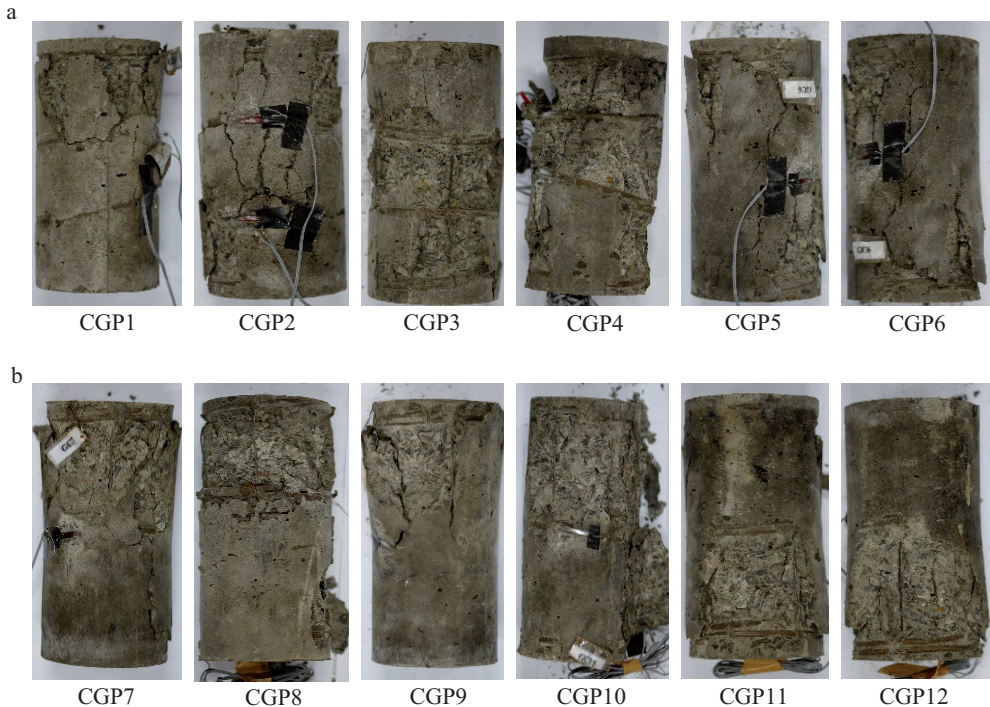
Failure pattern of confined geopolymer concrete: a – CGP specimen, hoop spacing 60 mm; b – CGP specimen, hoop spacing 100 mm
